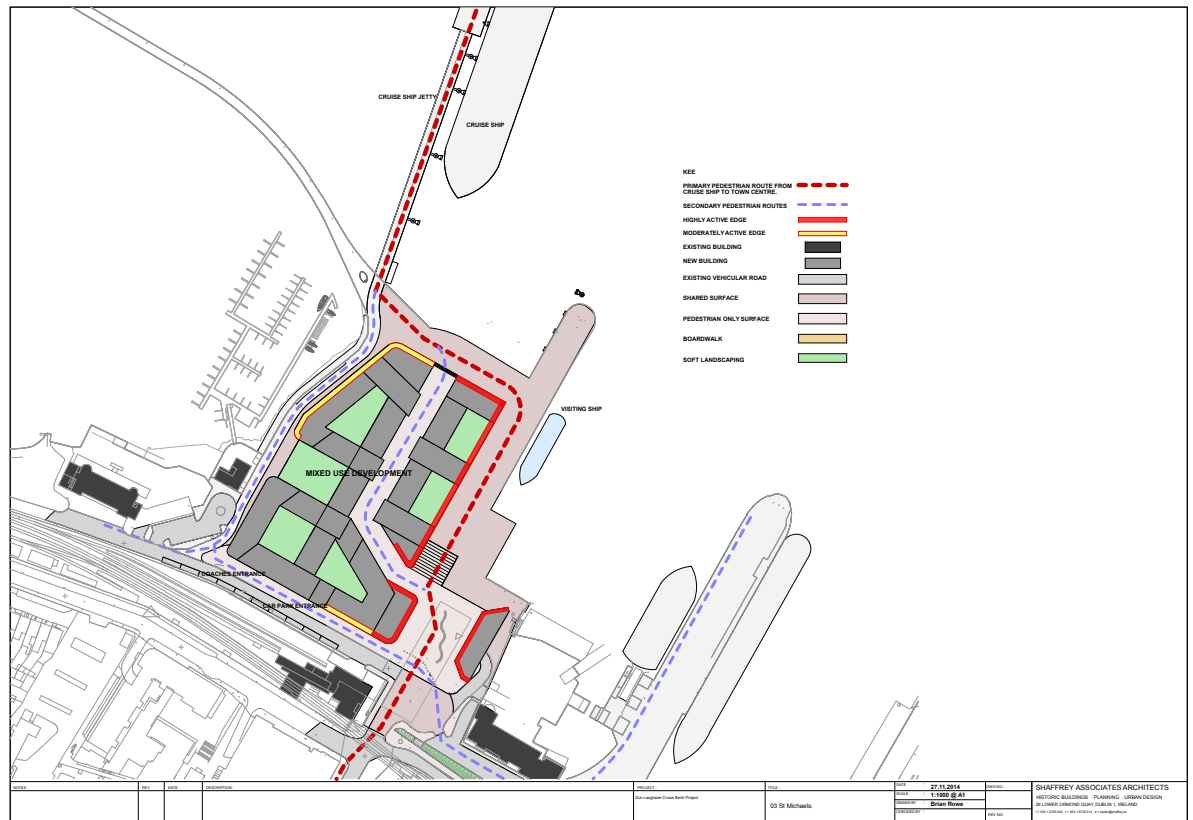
Pedestrian route from cruise ship to town centre proposed under this planning application.
